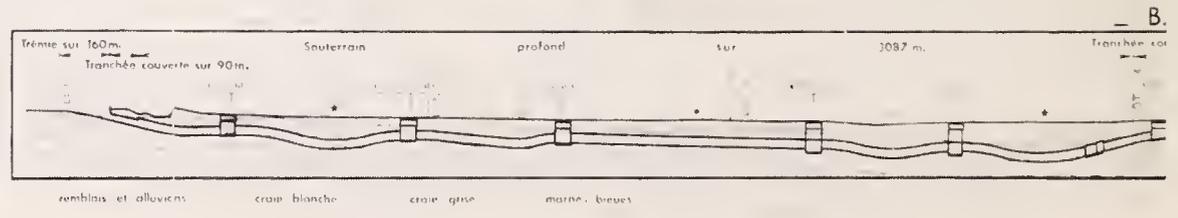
LILLE METRO PLAN -- LINE 1
